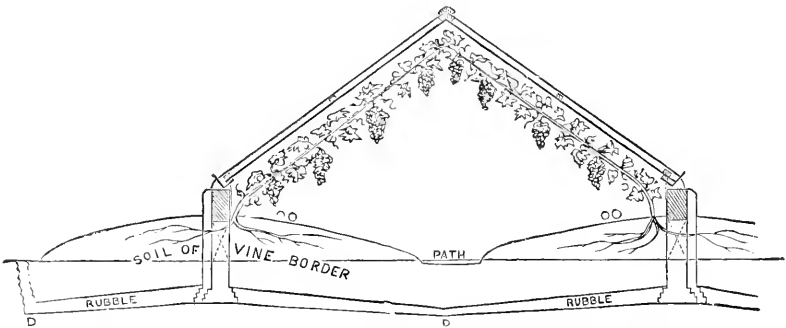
SECTION OF SPAN-ROOF VINERY (to show slope of border).
